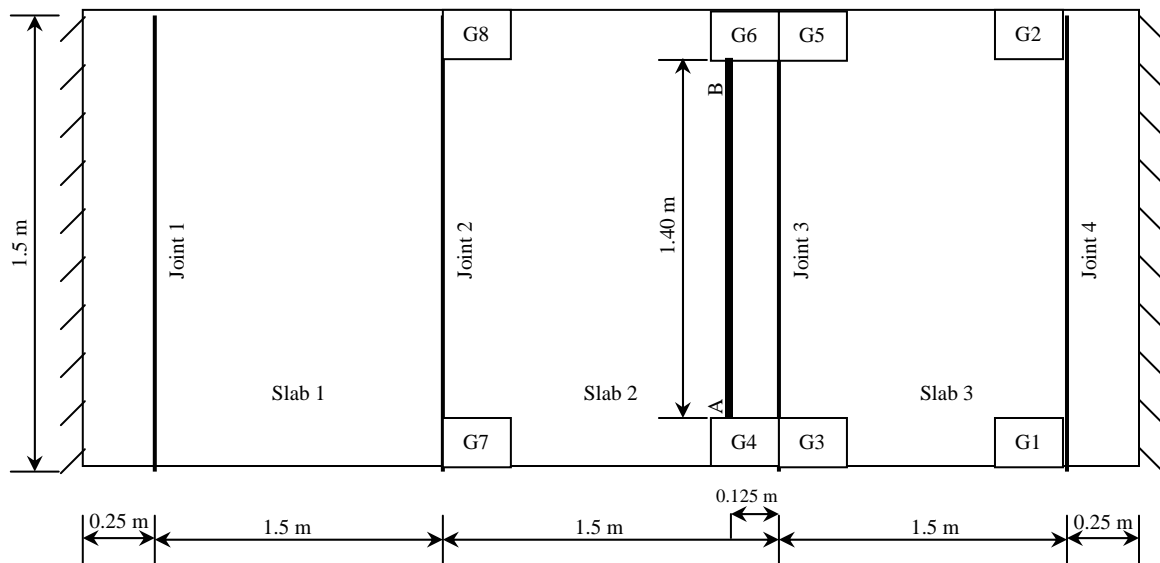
Plan of testing for EPDM rubber Joiner and PVC Joiner
